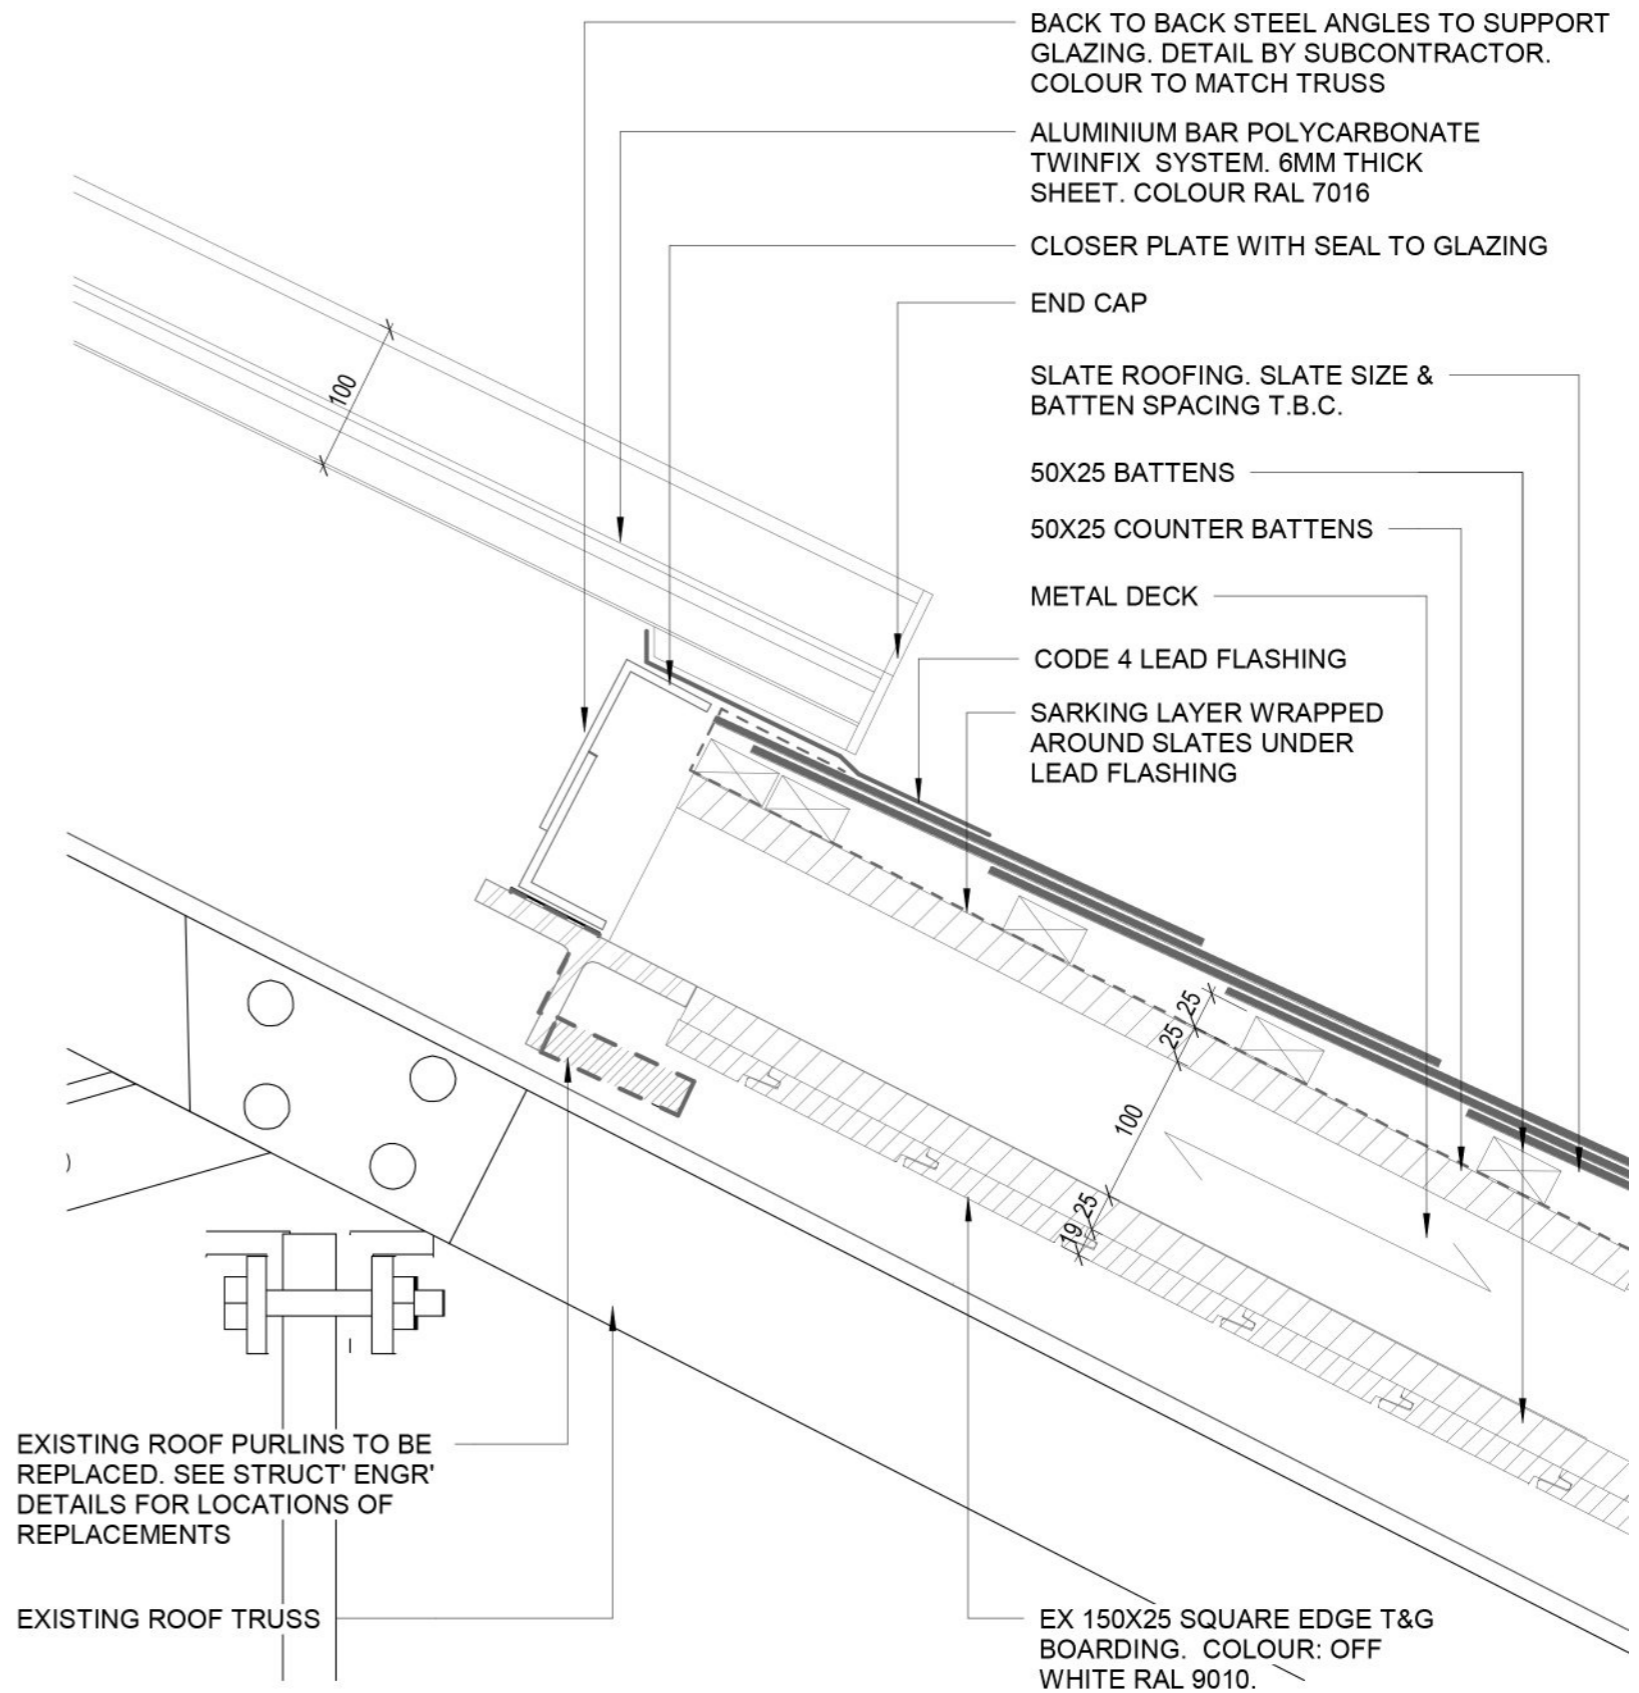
Section detail showing roof light and slate roof interface
